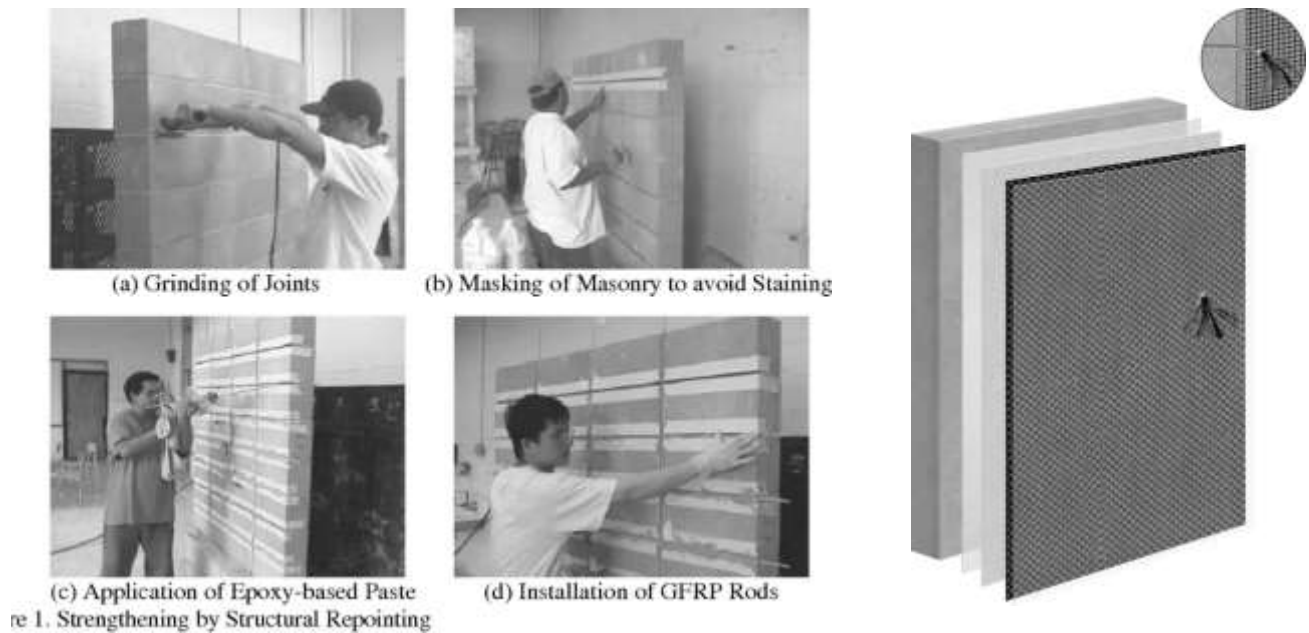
Strengthening of Masonry Walls using FRP Structural Repointing
